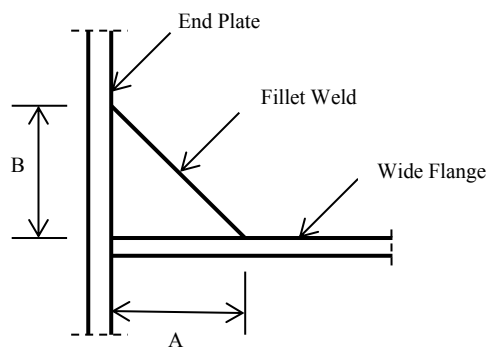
Schematic sketch for the dimensions of the proposed fillet weld geometry.
